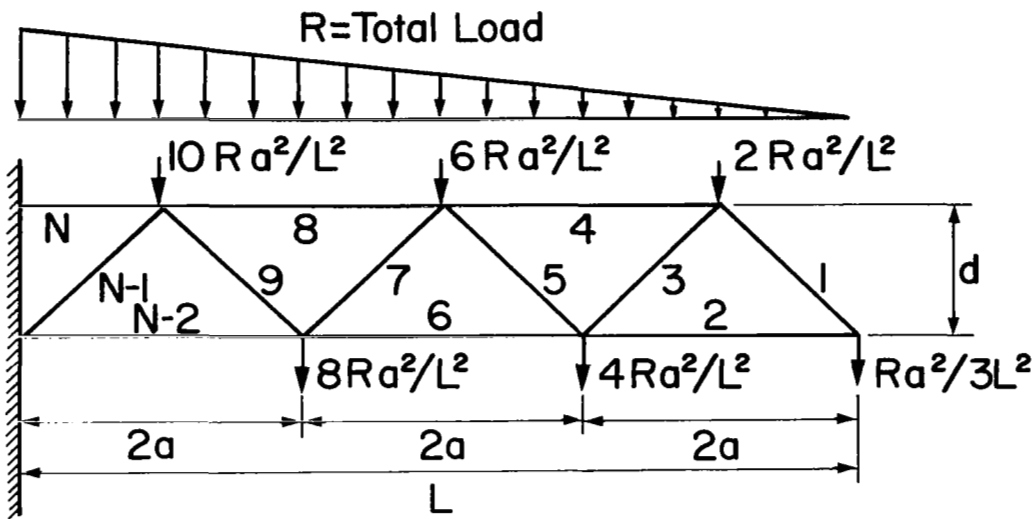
TRUSS UNDER A TRIANGULAR LOADING
